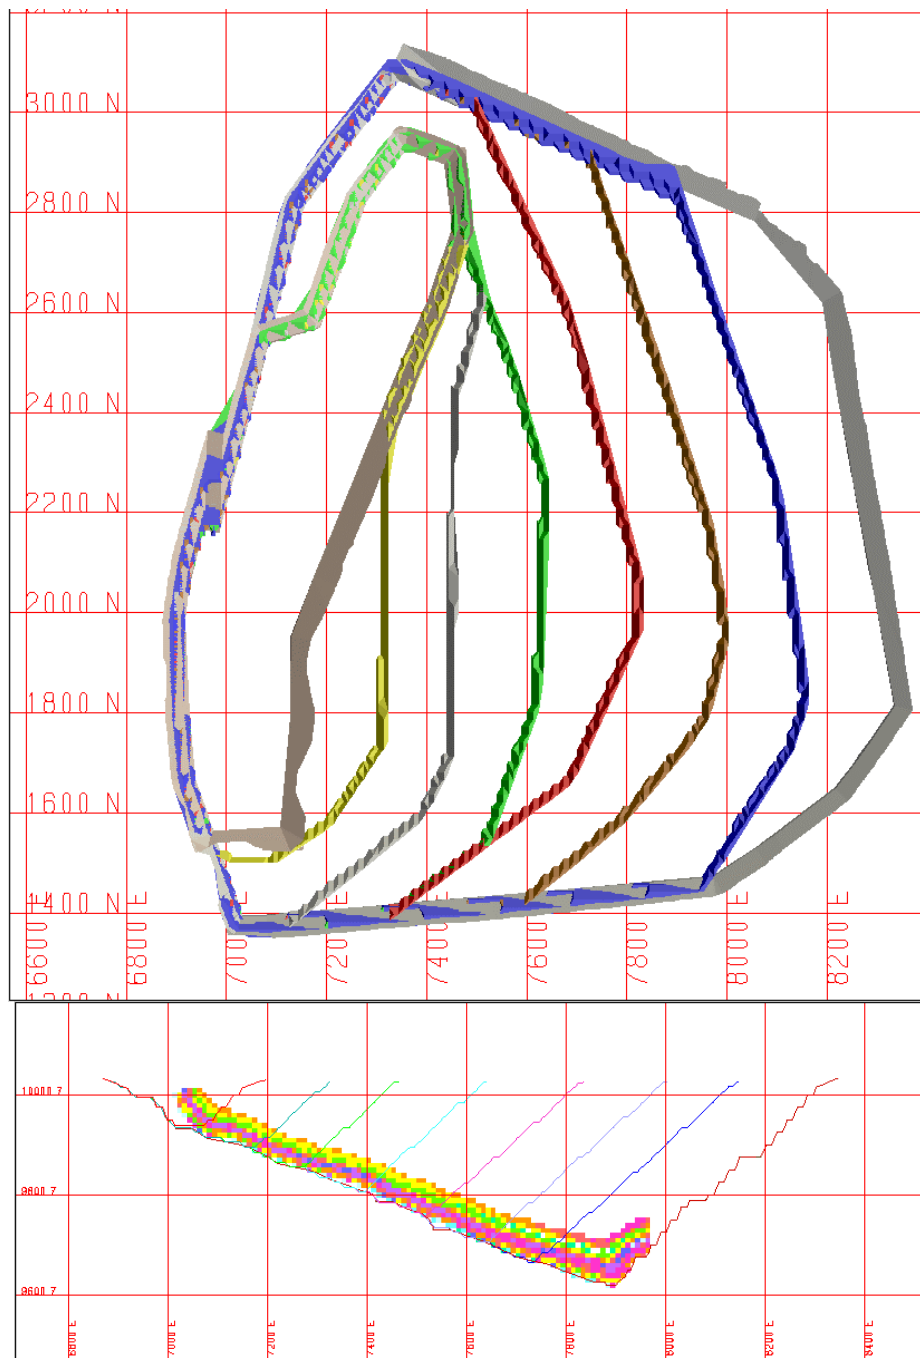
Plan and Cross Section of One Possible Staged Pit Development Scenario
